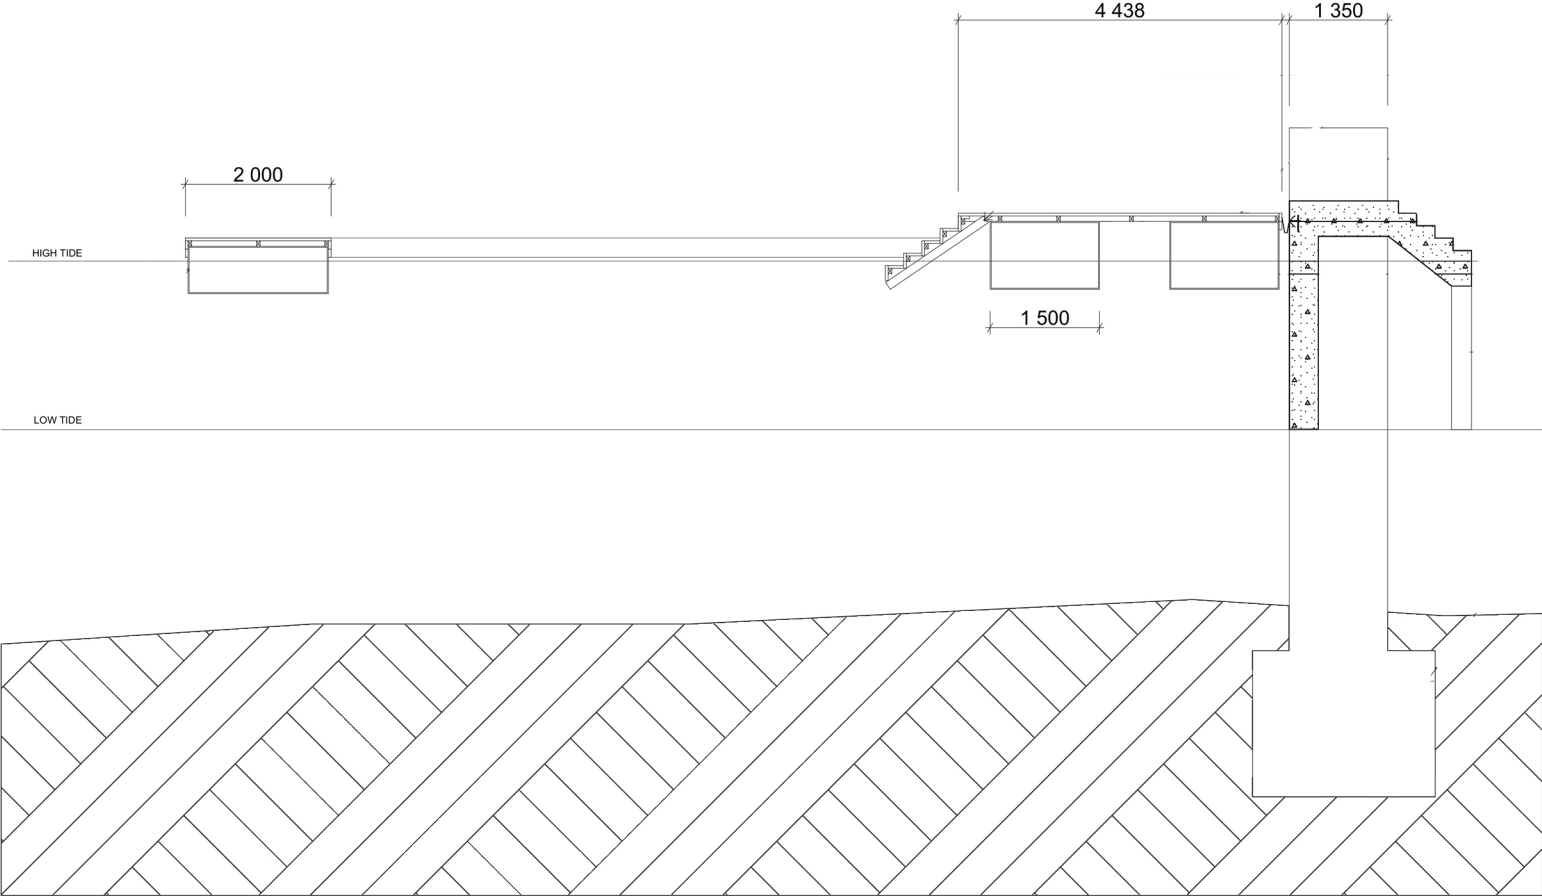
2Swimming platform section;(Rorich, 2020: own drawing)
